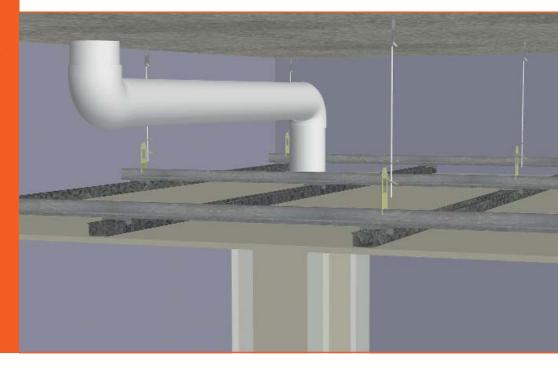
Shaft Wall Ceiling Detail System KSHWC4 only
